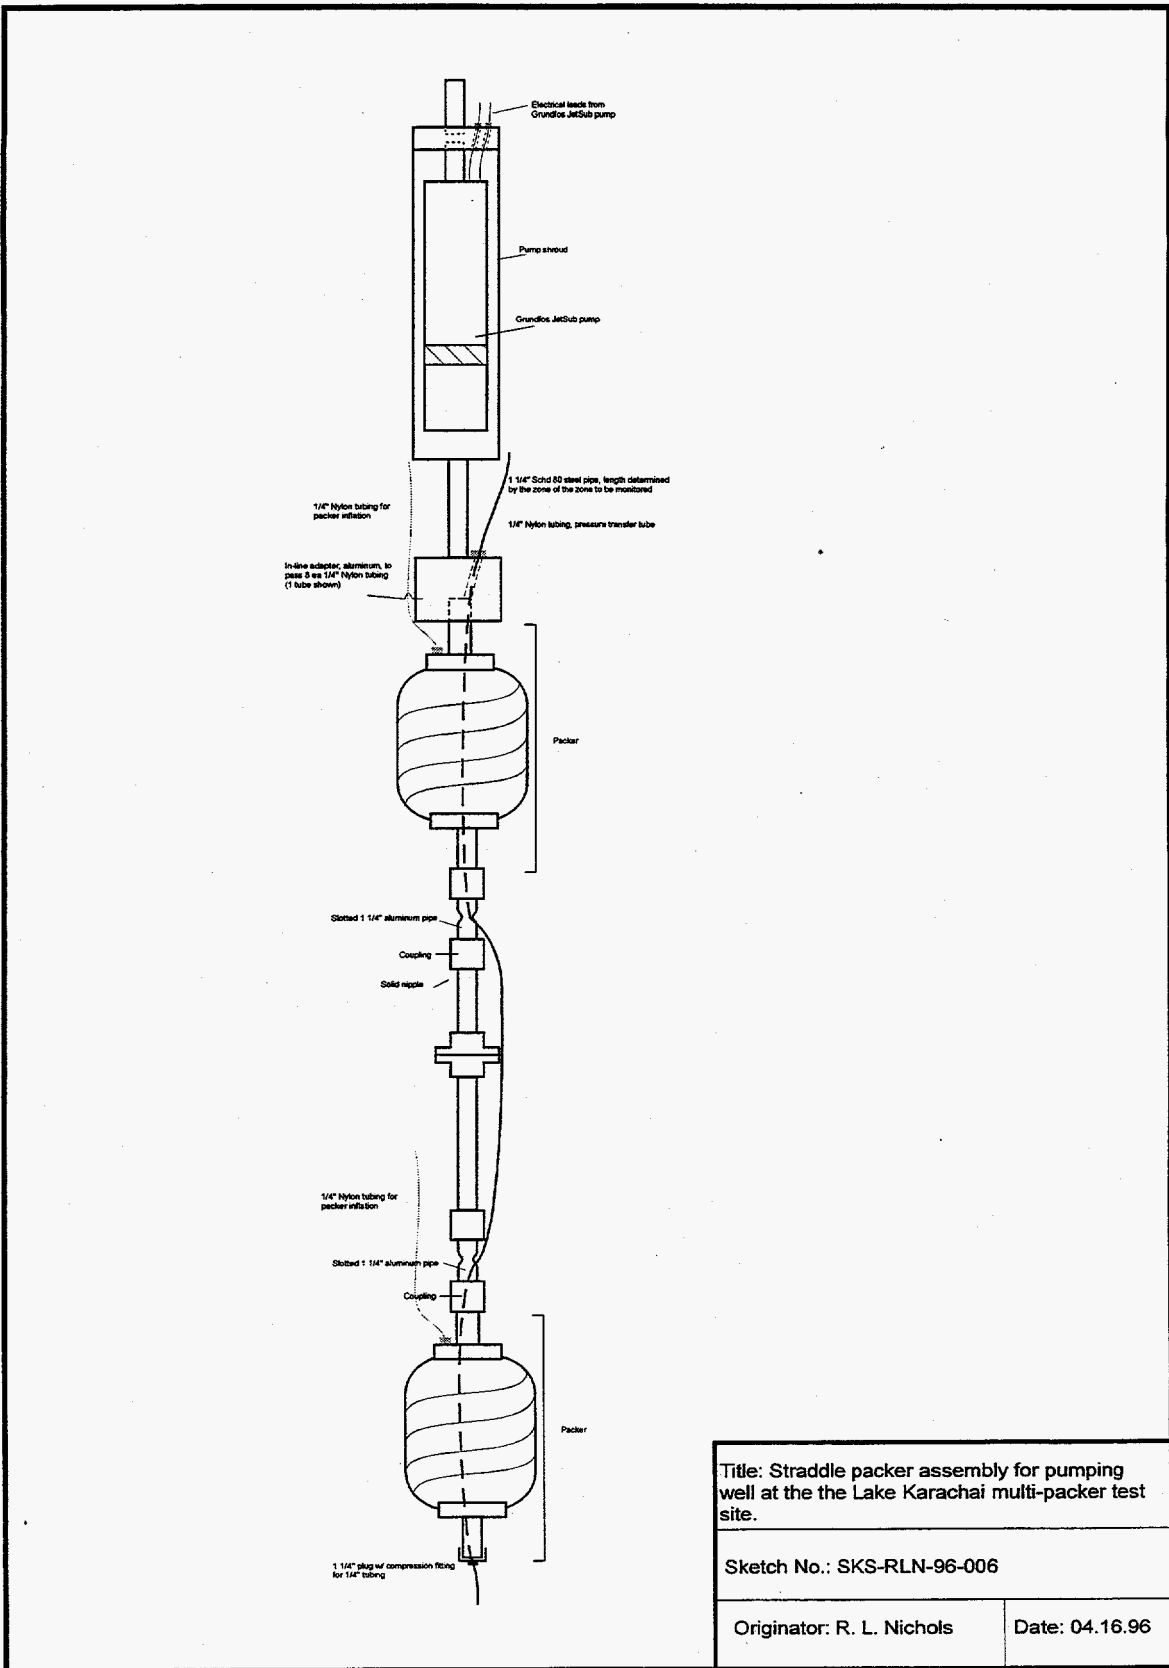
Schematic drawing of straddle packer assembly for pumping well 1/96.
